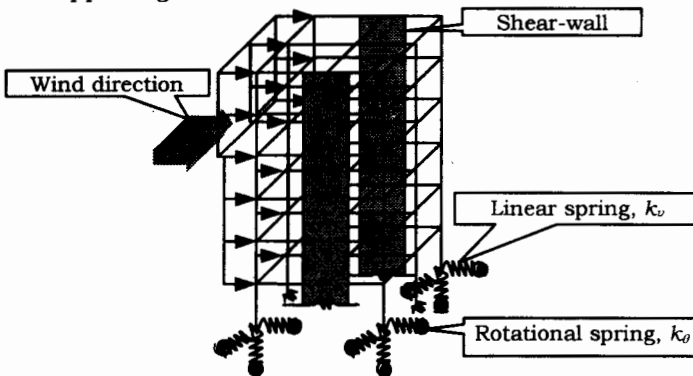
Soil-Structure Interaction Model for a Typical Frame-Shear Wall System
